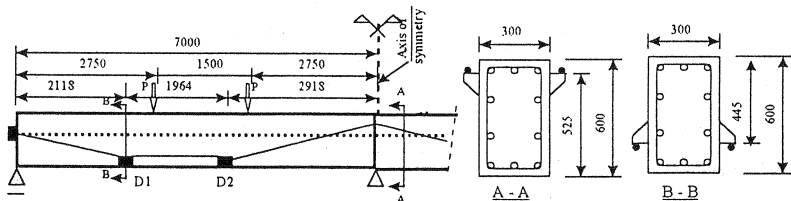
Layout scheme of two continuous span (Dimension in mm)
